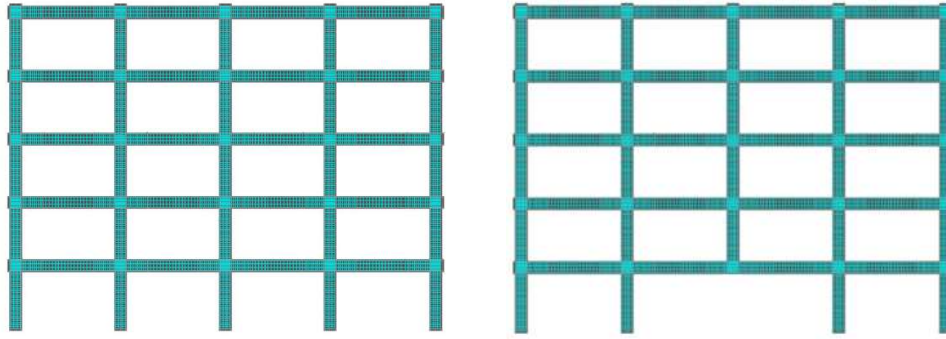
Representation of longitudinal and transversal reinforcement: left model with column, right model without the column
